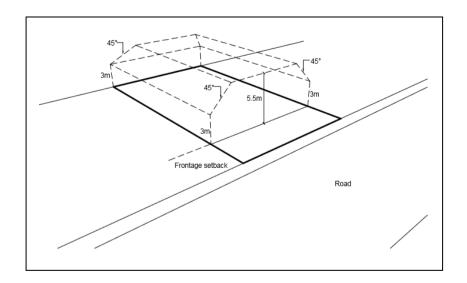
Building envelope as required by clause CCO-S5.7.1 A1 and A2 that is in substitution for General Residential Zone – clause 8.4.2 A3 and clause 8.5.1 A2
